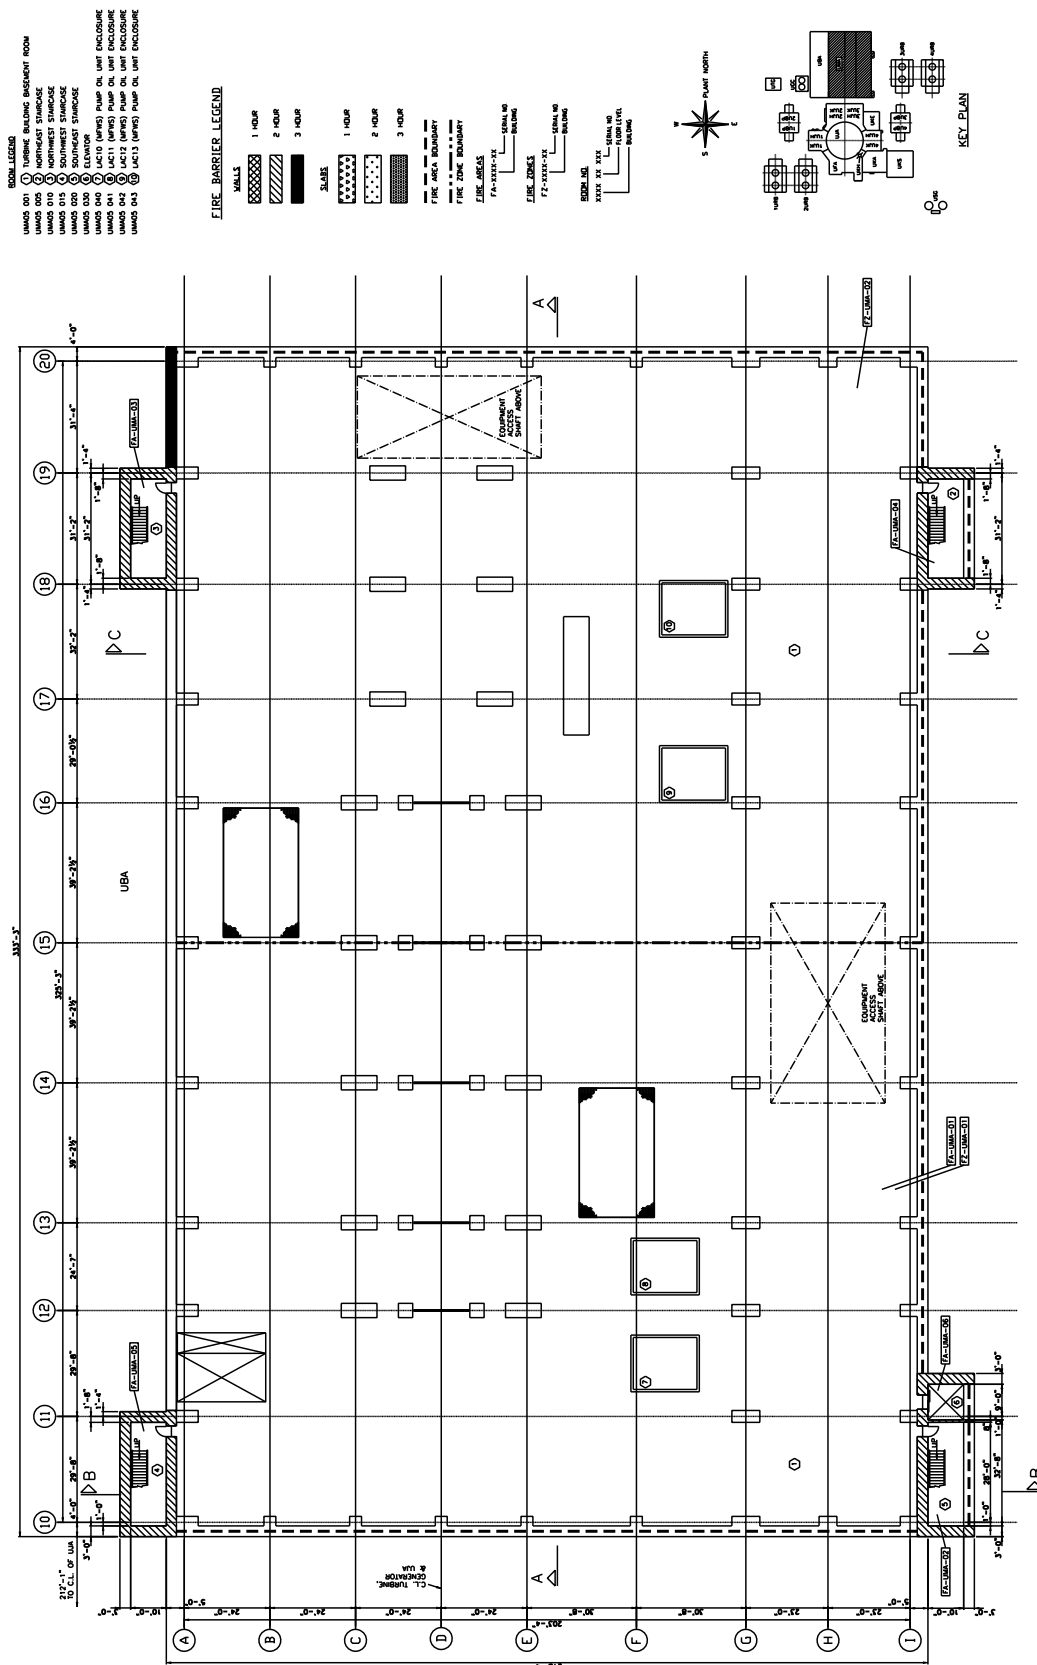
B-2—{Fire Barrier Building Plan at Elevation 0 ft}
